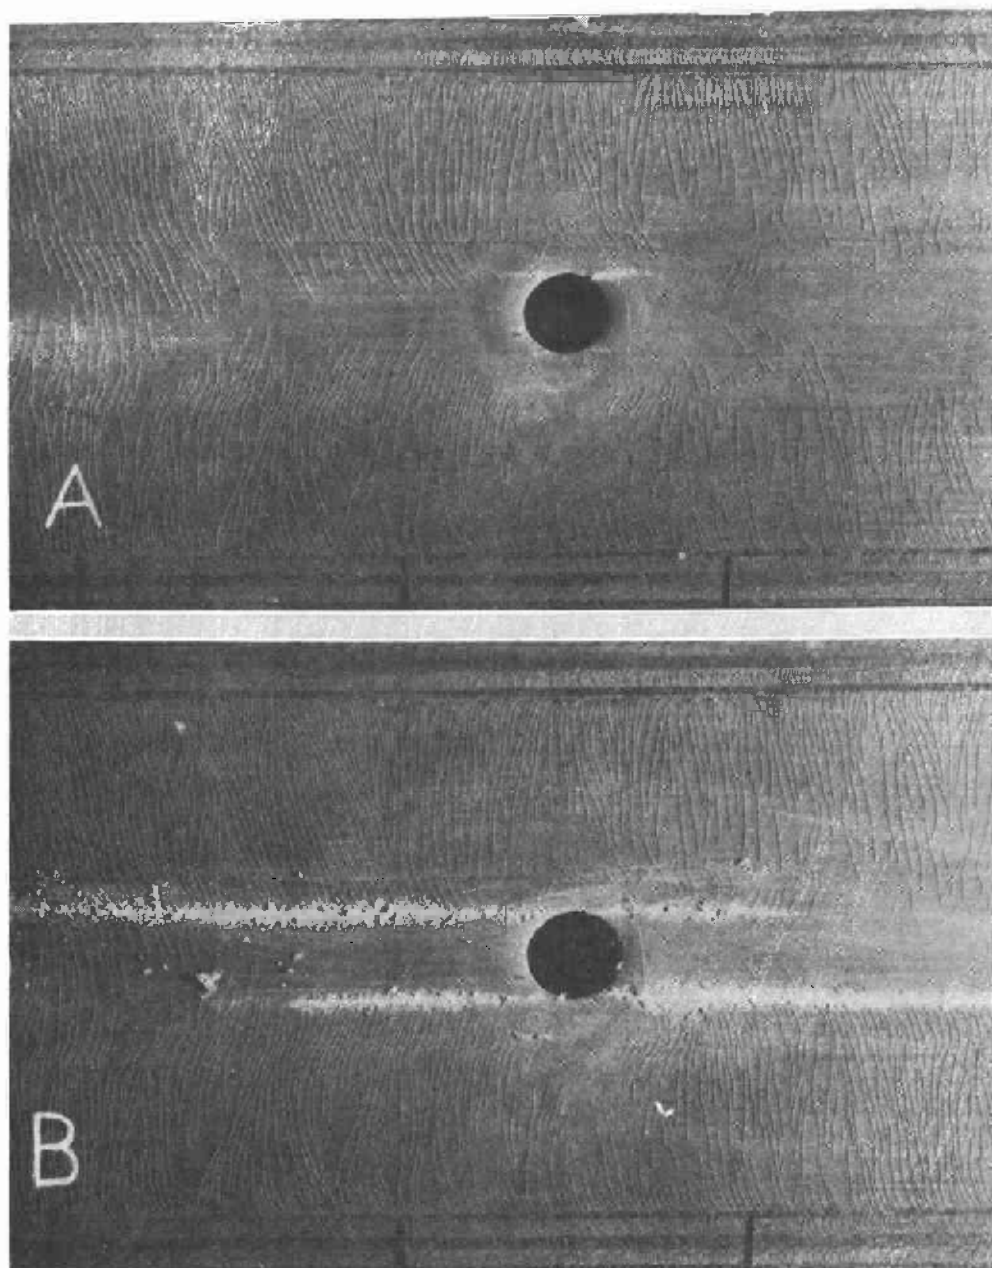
Vertical hole in tension flange of beam 2-T-2. A, brittle-lacquer stress pattern and start of shear failures at edge of hole. Load on beam was 16,500 pounds. B, increased length of shear cracks due to increase of load. Load on beam was 20,500 pounds.
